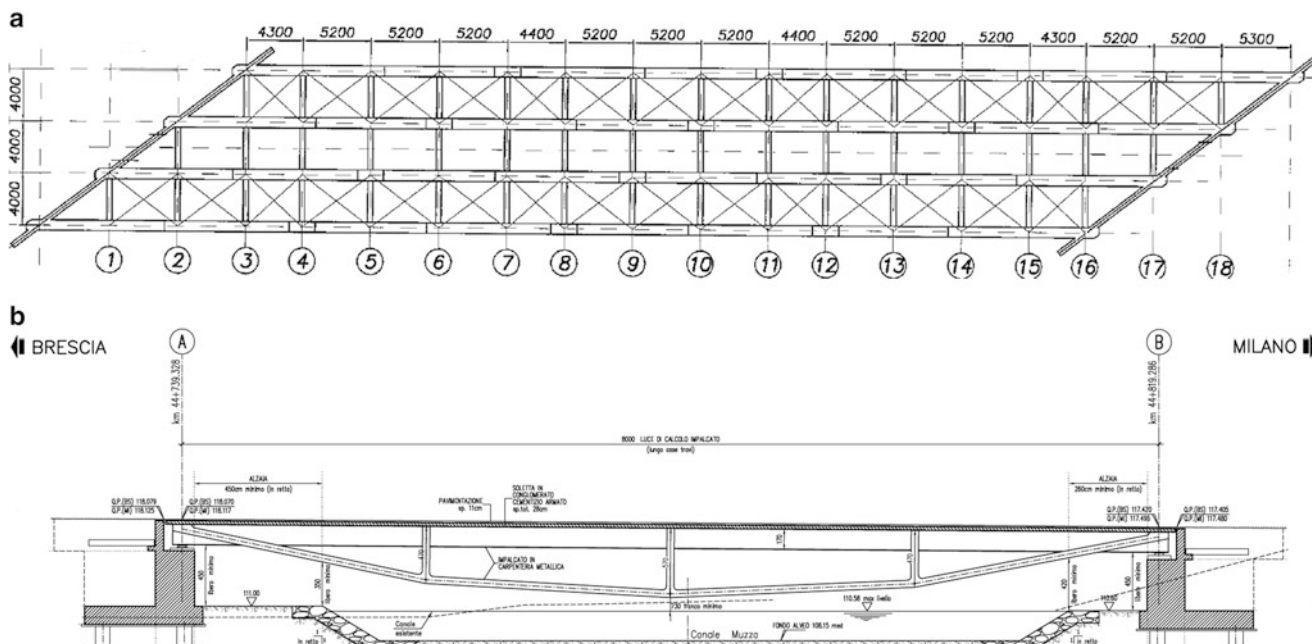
Muzza bridge, (a) plan view (b) longitudinal section
